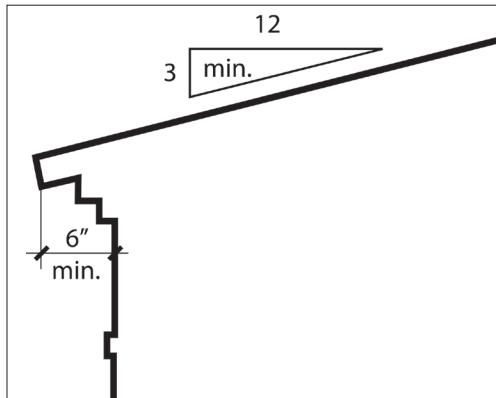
h: Diagram of minimum roof pitch and articulated overhang dimensions.
